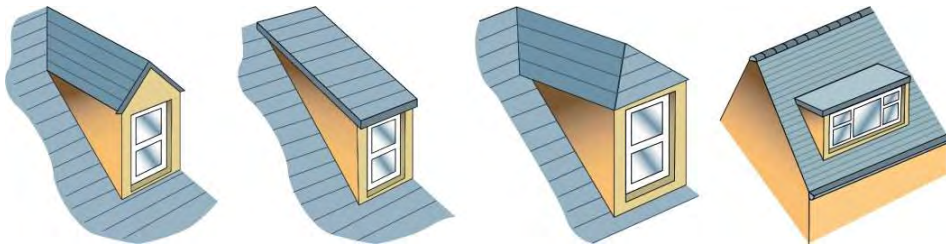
Example of roof types for dormer windows left to right: Gable, shed, hipped and flat.
